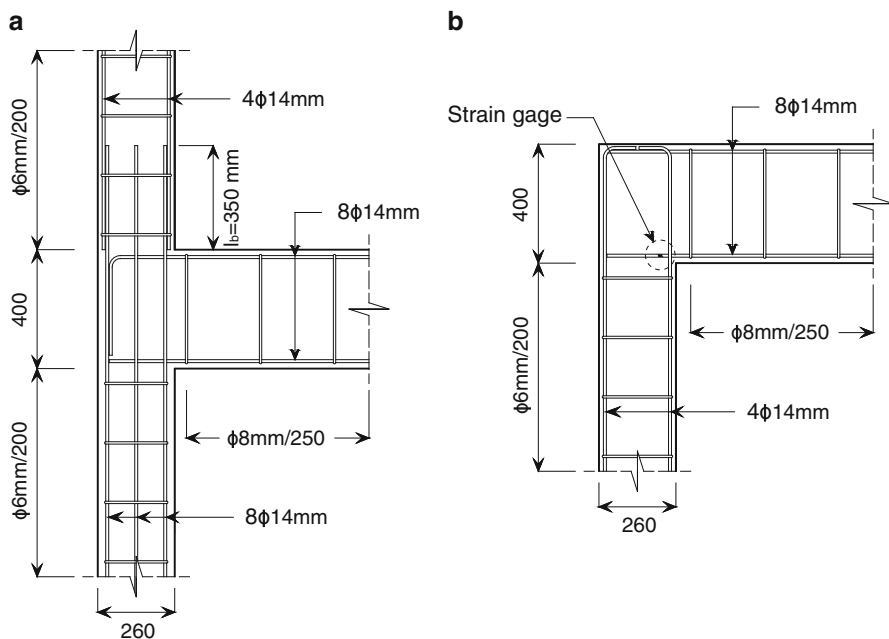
Detailing of columns and beam-column joints at (a) 1st floor, and (b) 2nd floor, X direction
